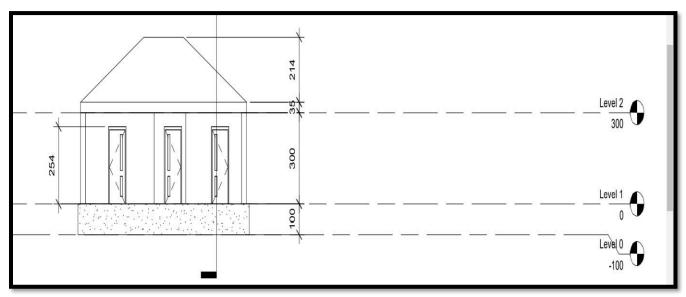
ELEVATION FOR PUBLIC TOILET IN MODAJ VILLAGE
